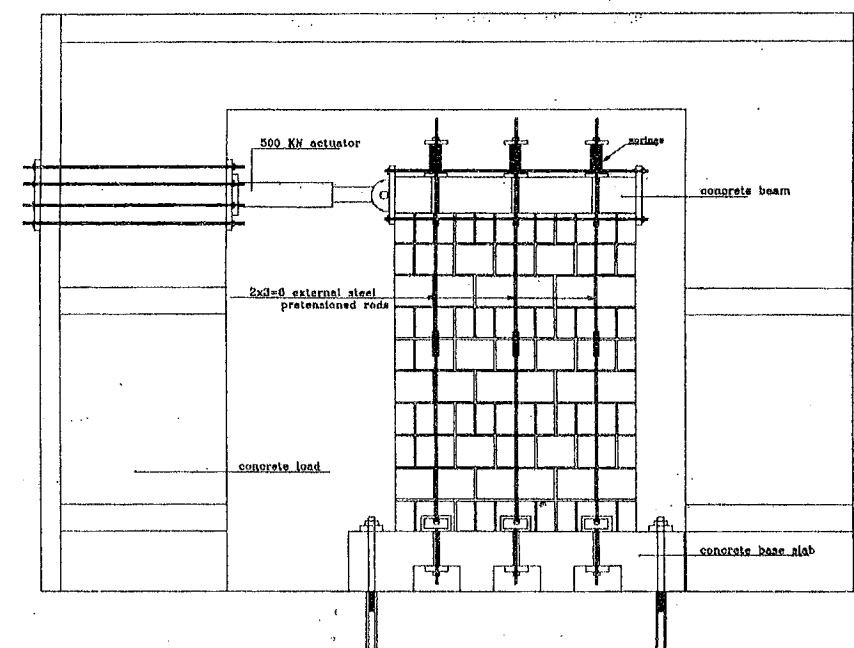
Test set-up for testing the seismic resistance of reinforced masonry walls
